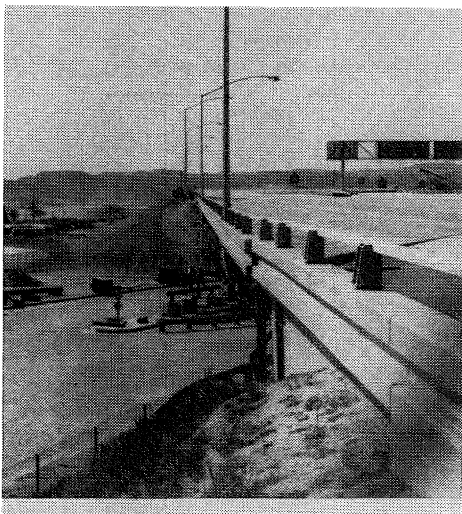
The skew bridges of the Foothill Boulevard Undercrossing tended to rotate producing displacements of the superstructures relative to the abutment wingwalls of about 4 in.
